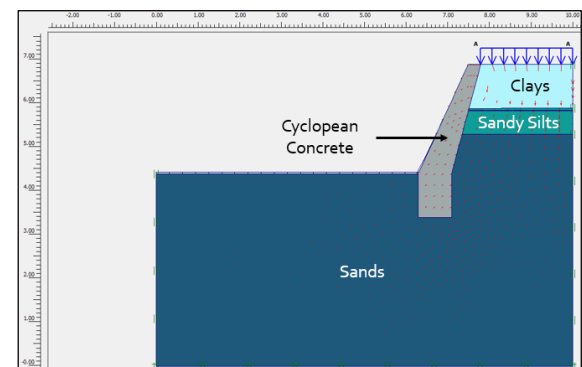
The modeling results of the retaining wall at location 2 RW 26 Cipageran
